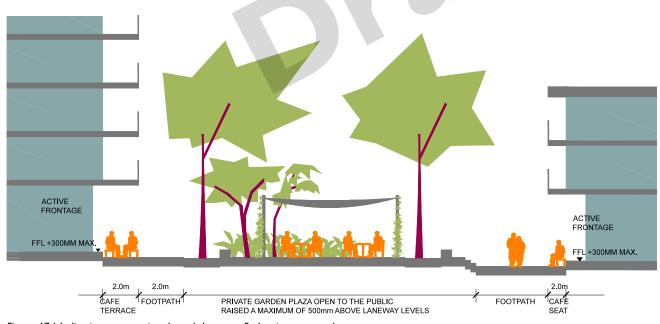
| Indicative cross section through Laneway B showing courtyard space
